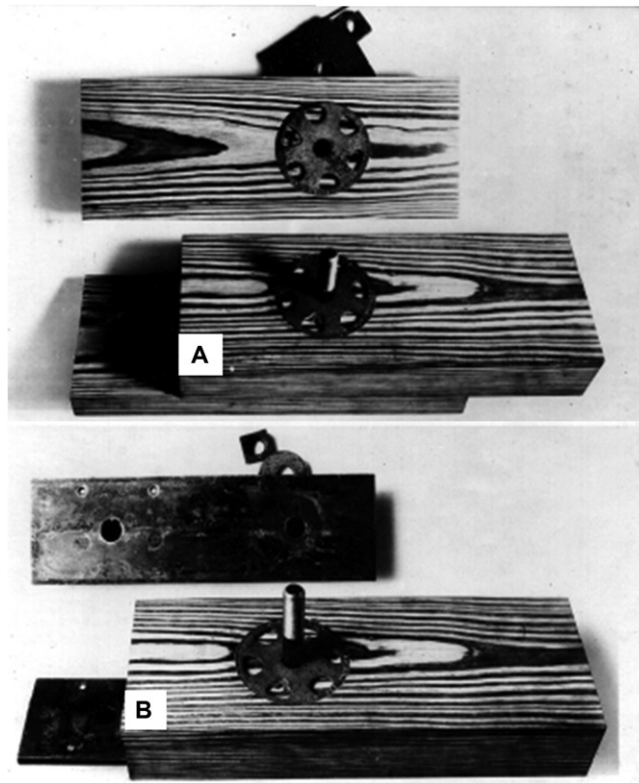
Joints with shear plate connectors with (A) wood side members and (B) steel side plate.
